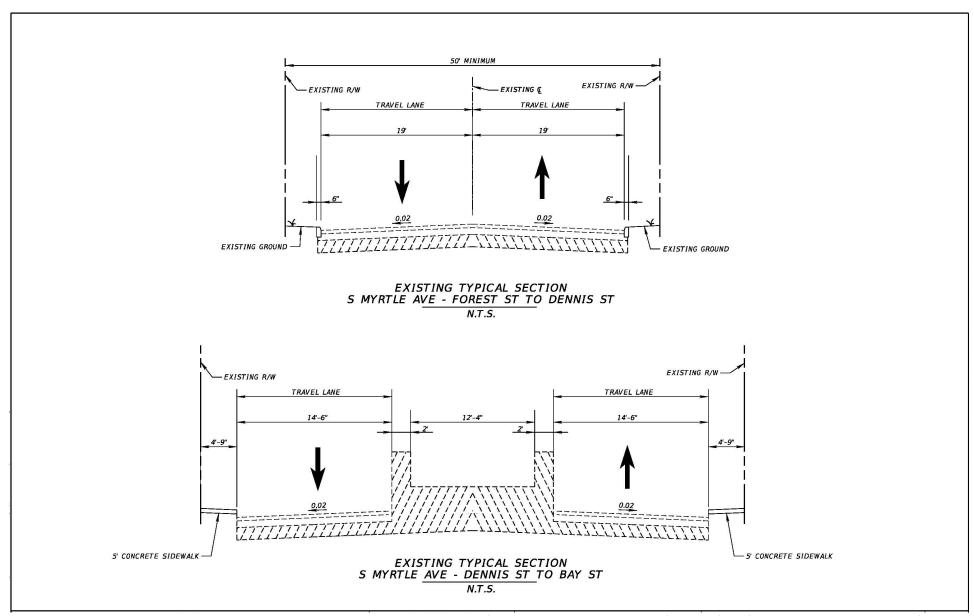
Myrtle Avenue Typical Sections (Forest Street to Bay Street)
